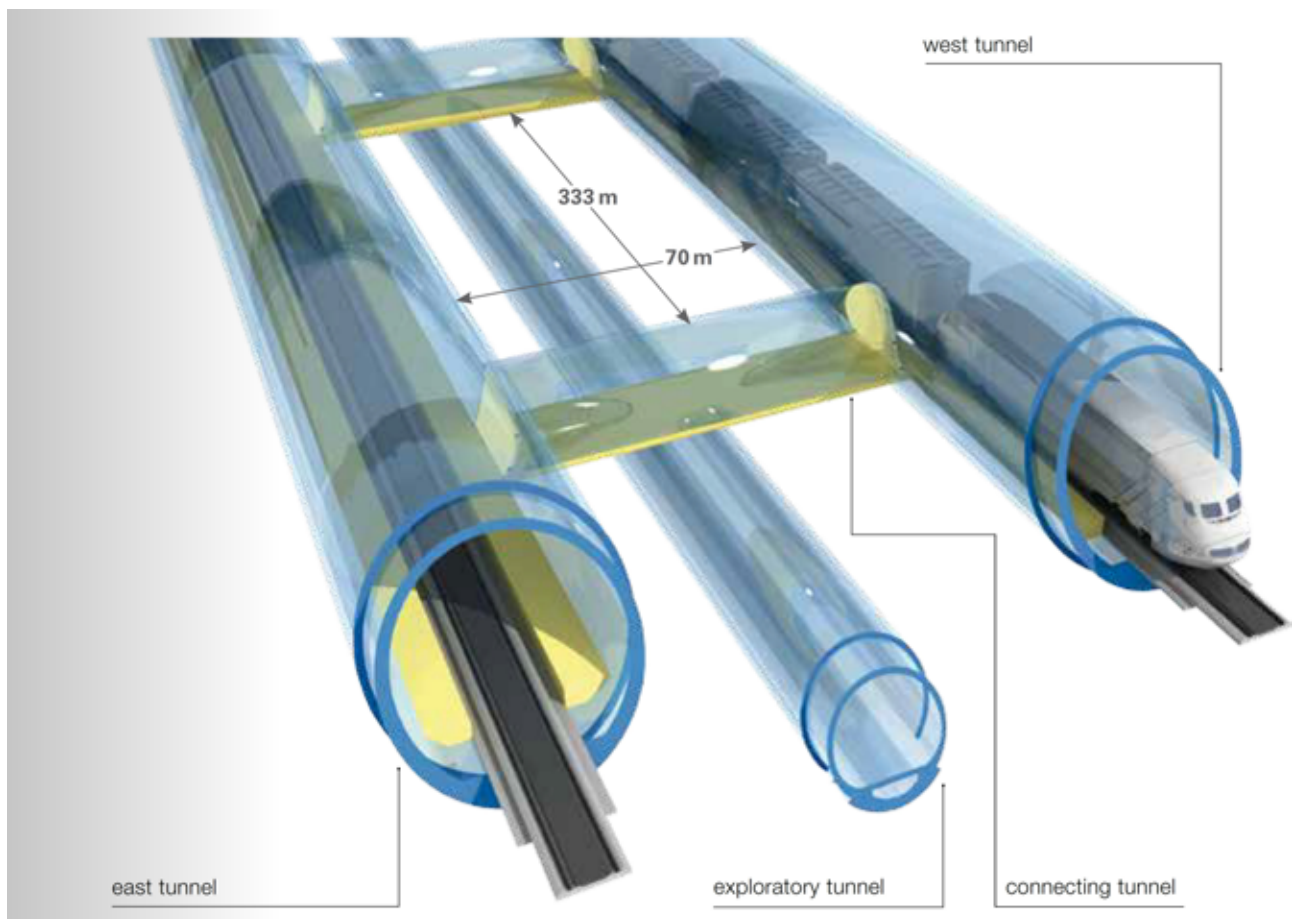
The tunnel system with the exploratory tunnel , the two single-track main tunnels and the smaller tunnels connecting the two main tubes every 333 m.
